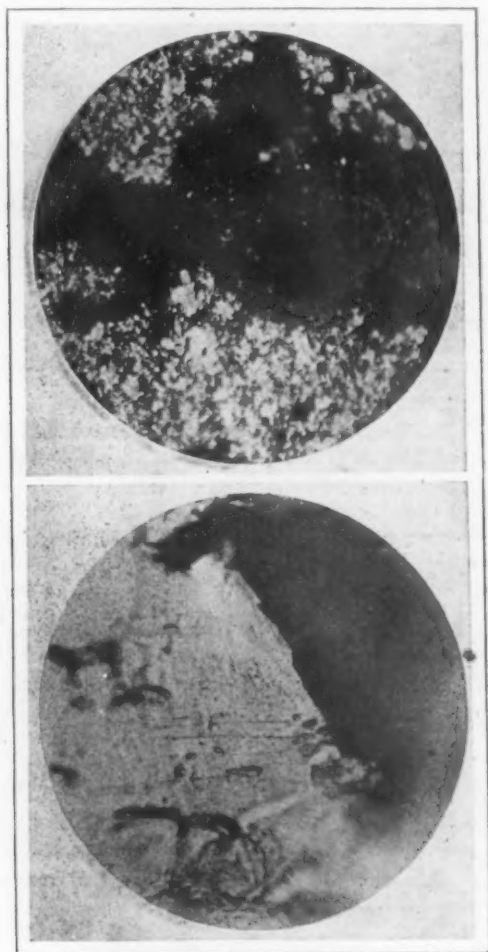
Fracture of Defective Iron Post. Four Diameters. Fig. 2—Edge of Fracture in Defective Iron. Photomicrograph Reduced One-Third from 250 Diameters
